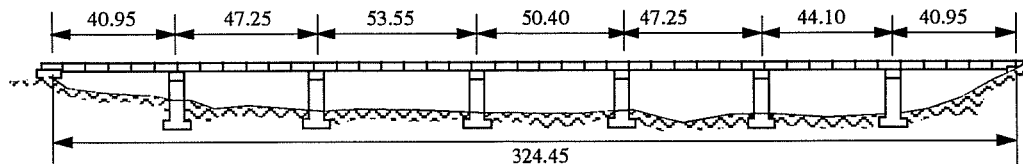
Bubiyan Bridge (Kuwait), concrete segments with prestressed concrete triangular trusses (after Raspaud [25]).
